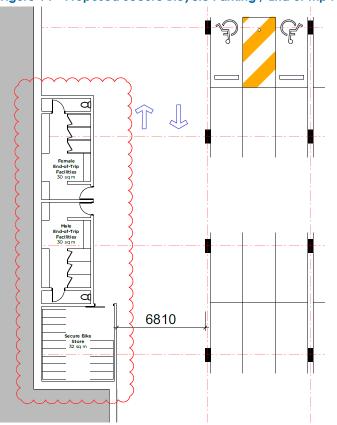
Proposed Secure Bicycle Parking / End of Trip Facilities for Staff
